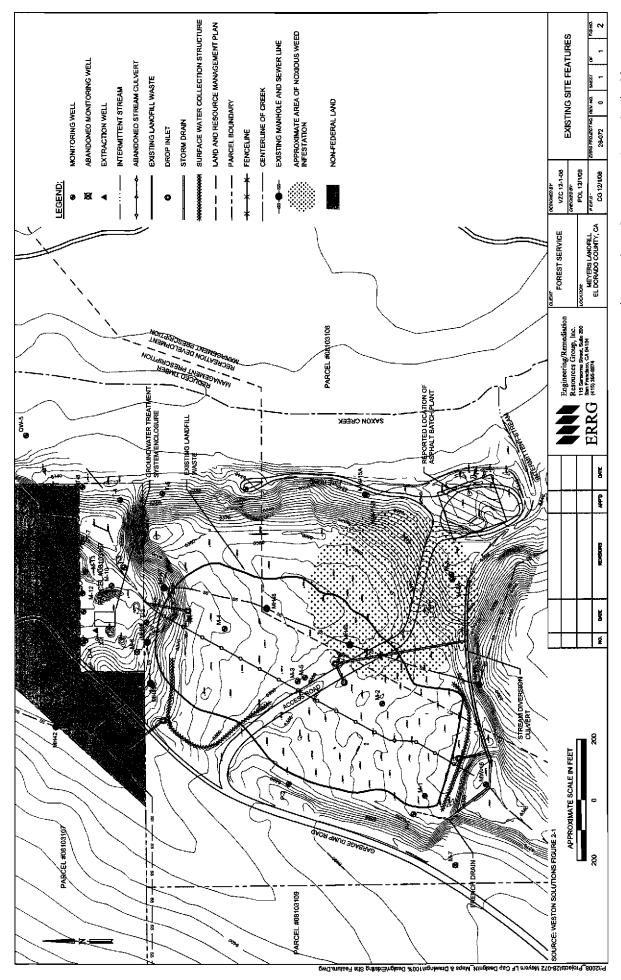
EXHIBIT B Site Portion of Trout Creek Trunk Pipeline
